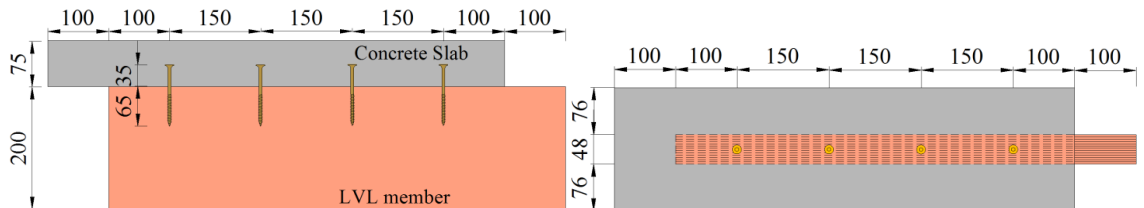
4WS spaced at 150mm specimen: (a) cross-section, (b) plan view (in mm)
